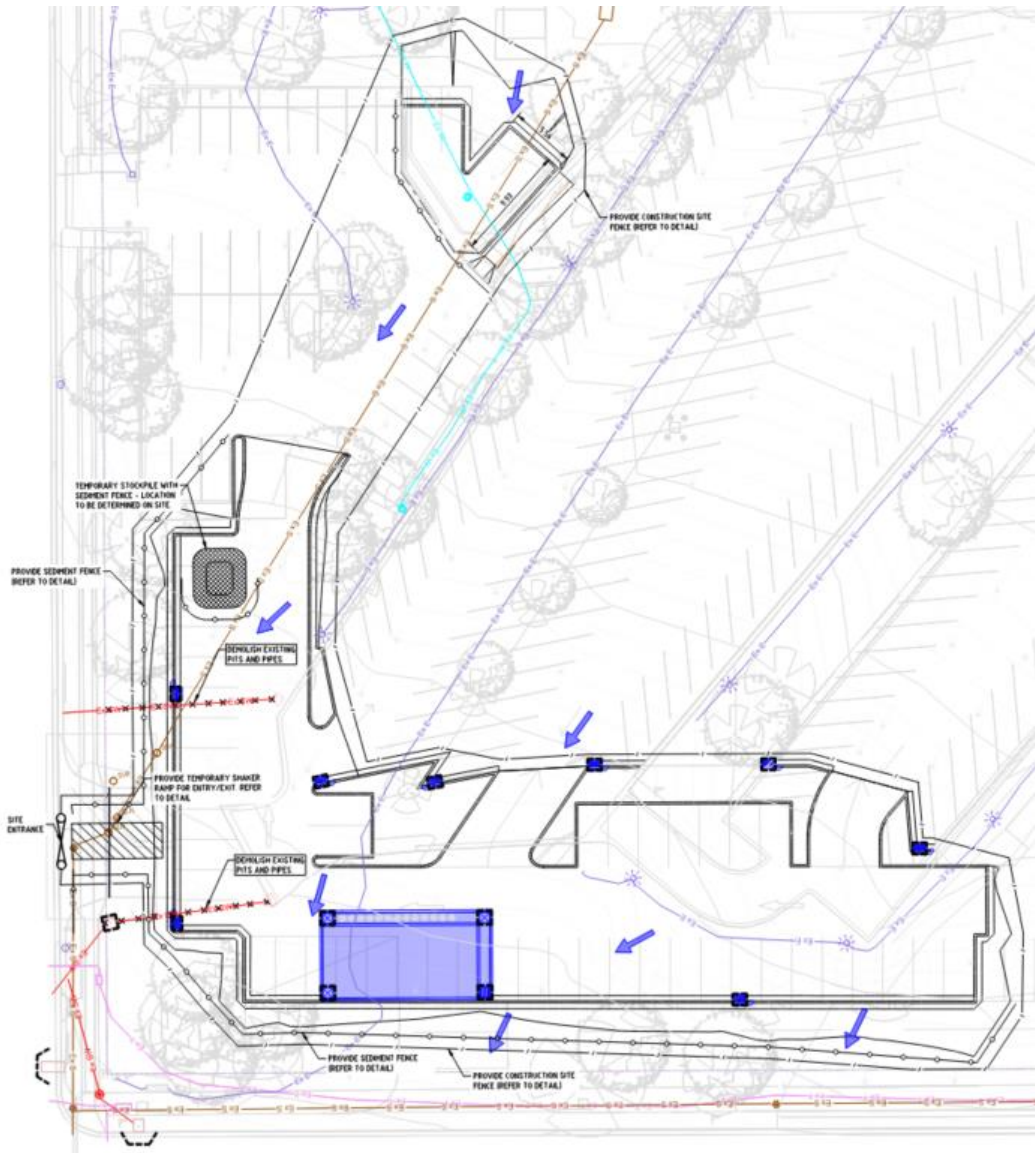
Southwest Carpark A Site Sediment and Erosion
